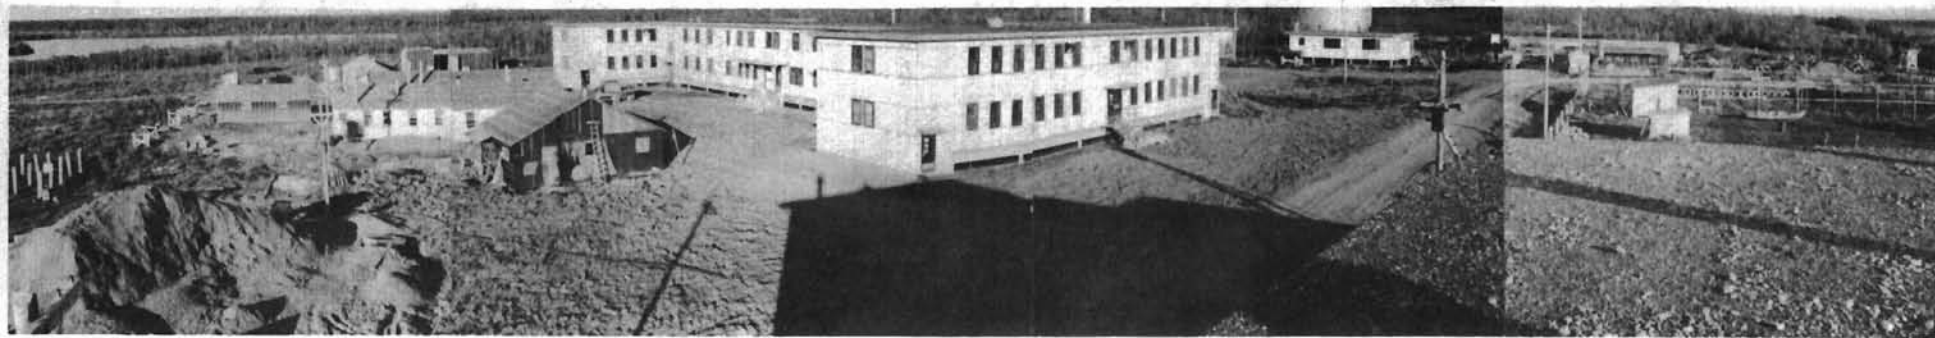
View southeast showing front elevation of completed hostel. Note teacherage in background (center-right). June 1958.
